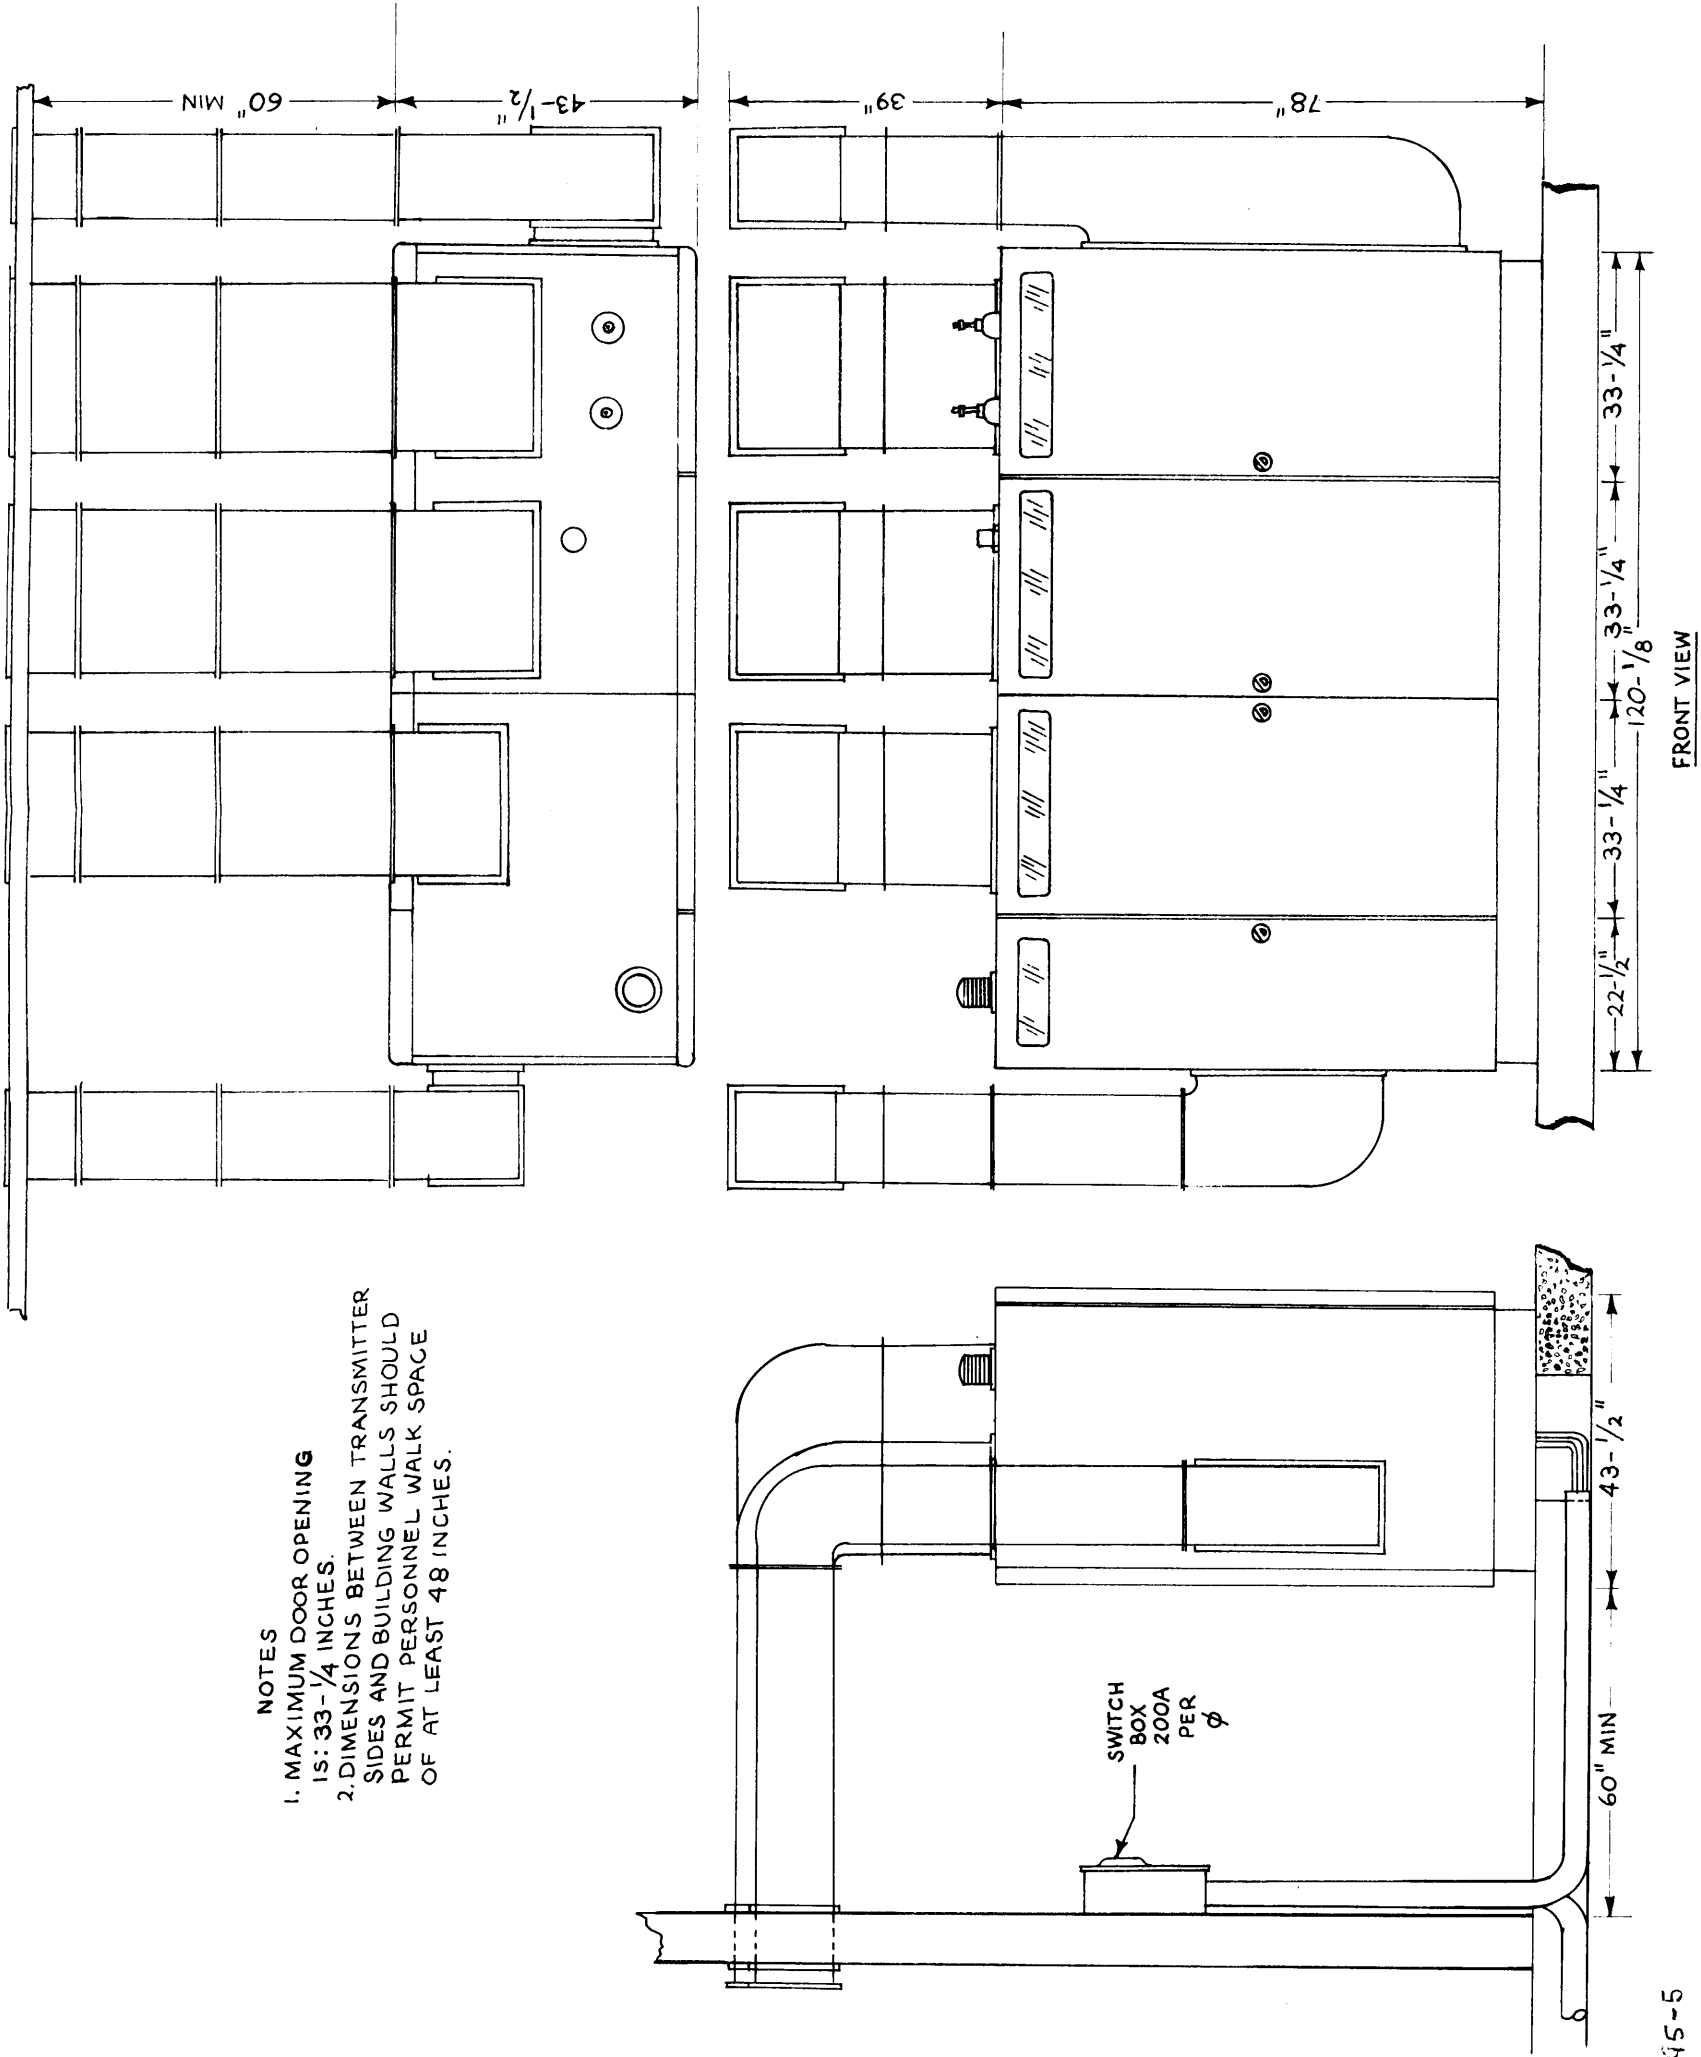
Dimensional Clearance Requirements, Installation Diagram (sheet 1 of 2).
